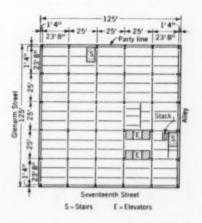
Typical floor of Denver Club Building, for which framing plan is given here, covers about 15,625 sq ft. There are 16 floors of general office space, 4 of club facilities, 2 for mechanical and electrical equipment, plus penthouse apartment.
